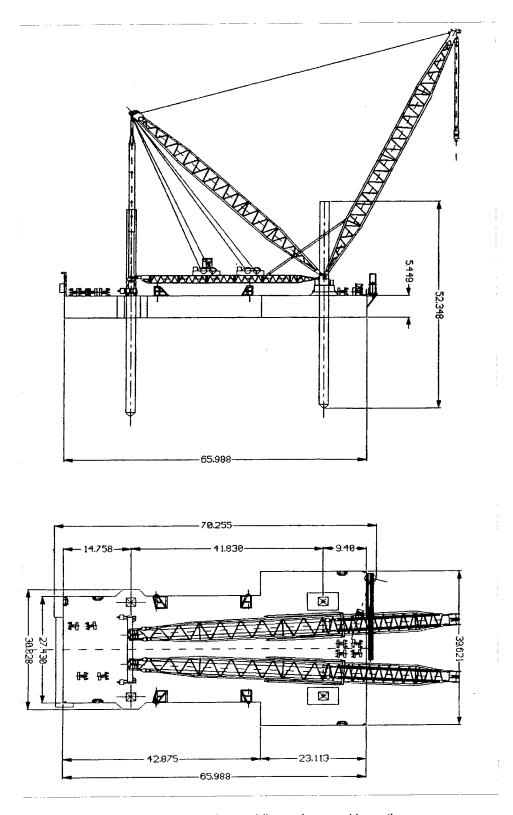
Lisa A jack-up crane barge (dimensions and layout)
